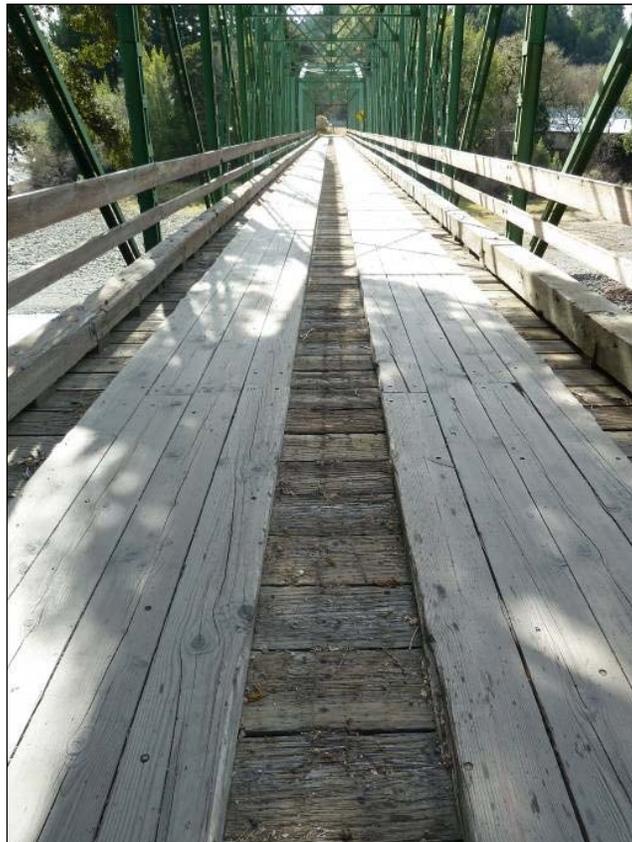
Honeydew Bridge, view looking southwest, February 27, 2013 (Photo by JRP Historical Consulting, LLC).
